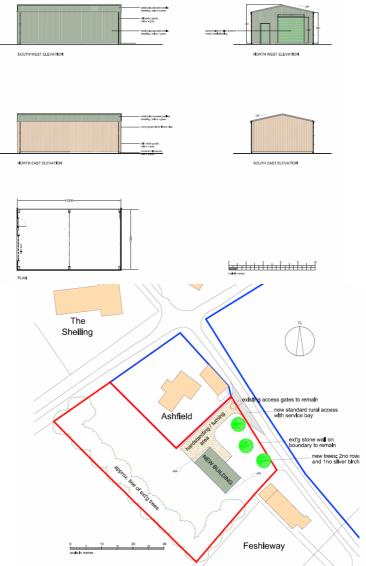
& 4 - AMENDED Site Layout and Shed Elevations
